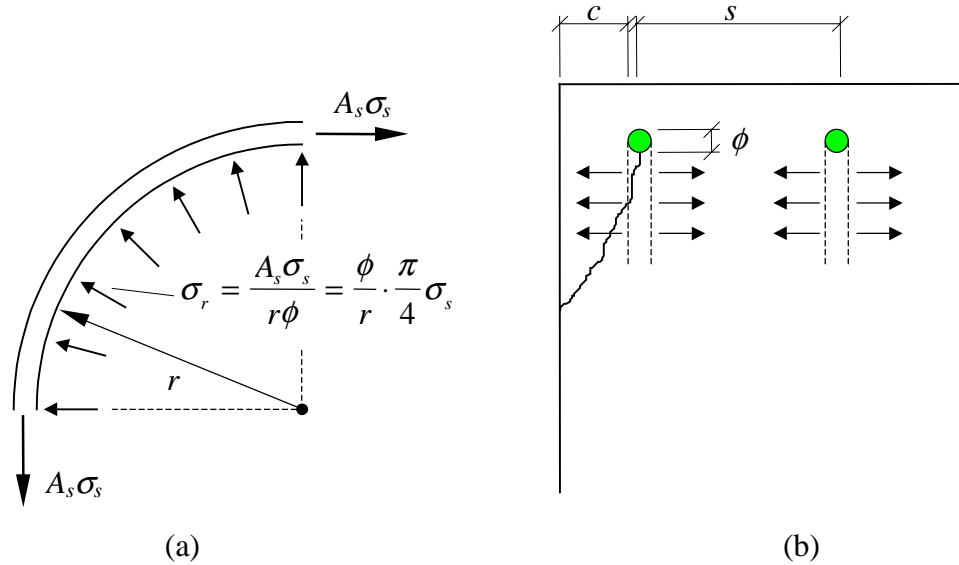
Schematic view of (a) radial compressive stresses and (b) possible splitting cracks in the plane of the bent bar. Based on Stroband and Kolpa (1983).
